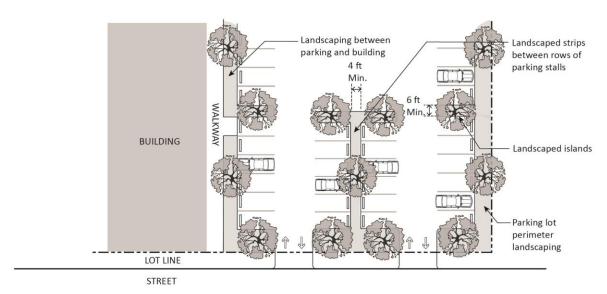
L: PARKING AREA LANDSCAPING
